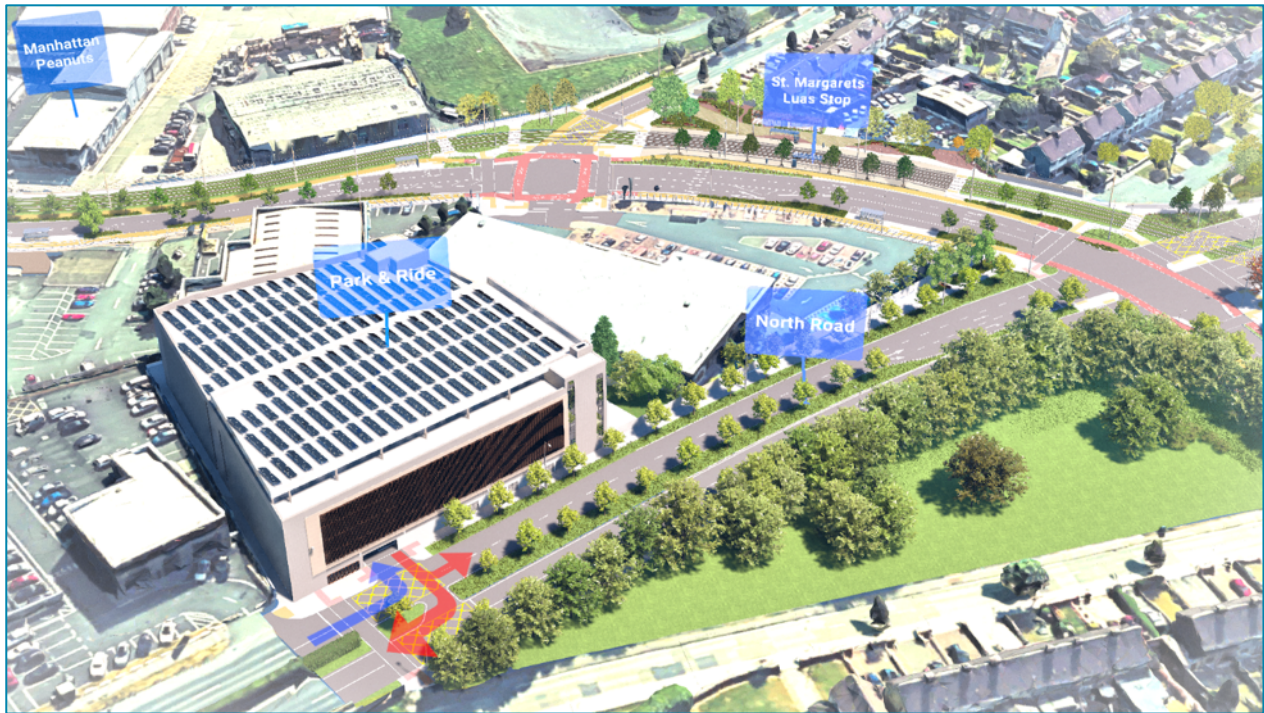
Proposed Park & Ride with access /egress arrangements via North Road, looking south-eastwards (15 years post-construction date)
